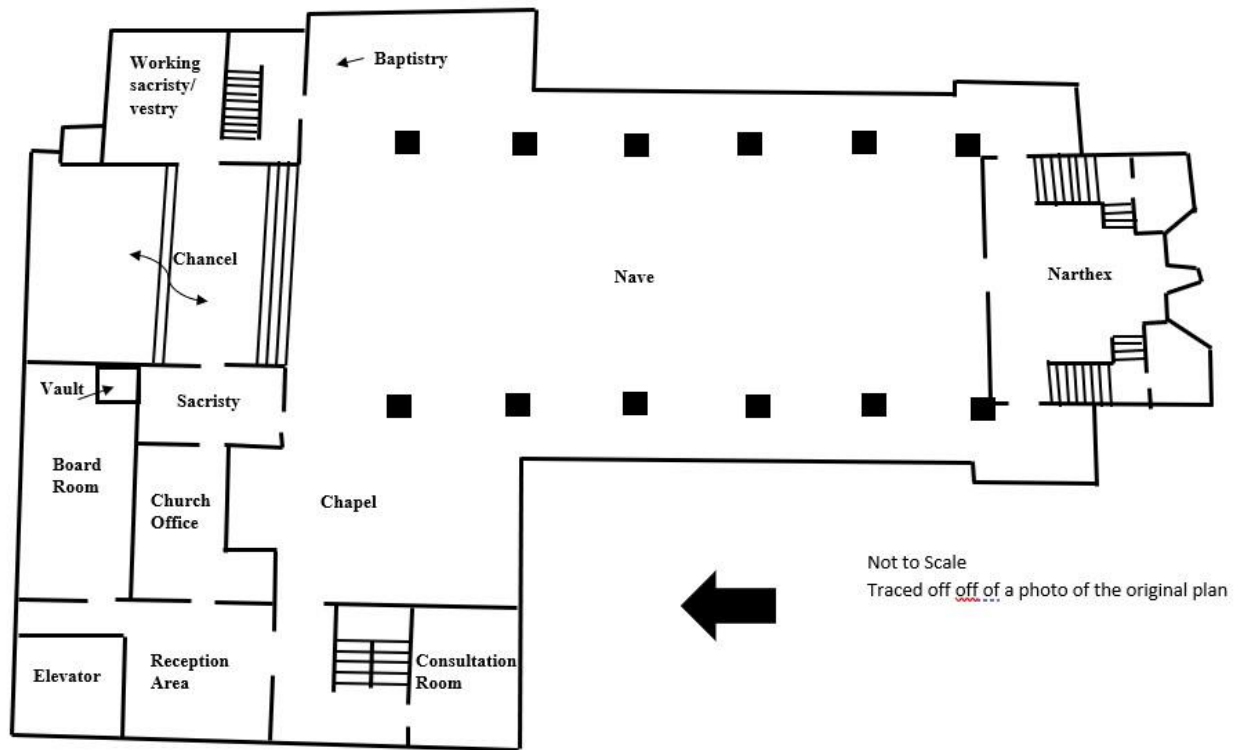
Zion Lutheran Church, Main Floor Plan
